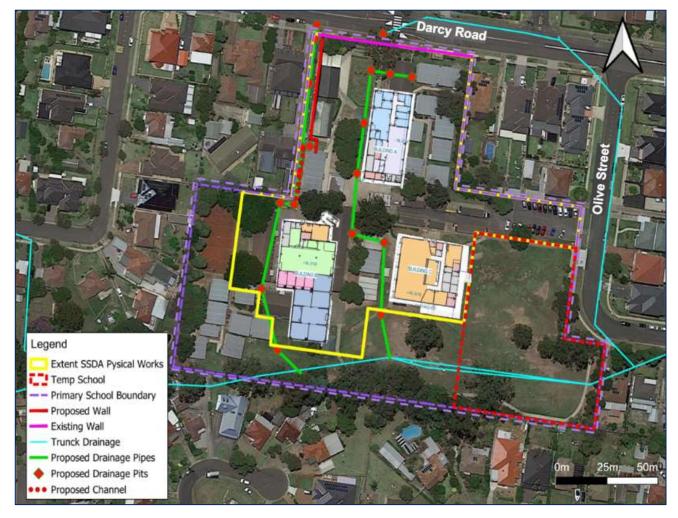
| Proposed civil works for flood mitigation (Source: Applicant's SRtS 2024)
